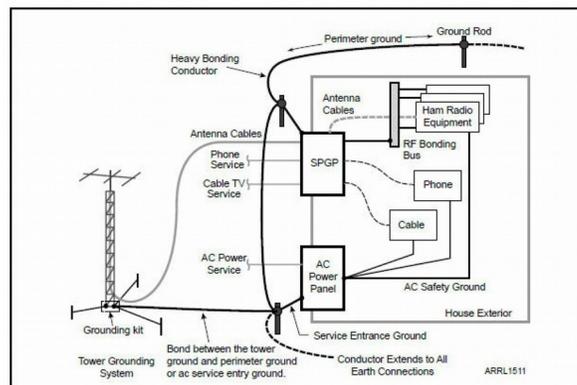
Overview of a building lightning protection system with an SPGP. All services that cross the building perimeter are protected by either the SPGP or the ac service entry ground connection. All ground electrodes are bonded together as well. Note that this drawing does not address protection on internal circuits from induced voltages and currents.
